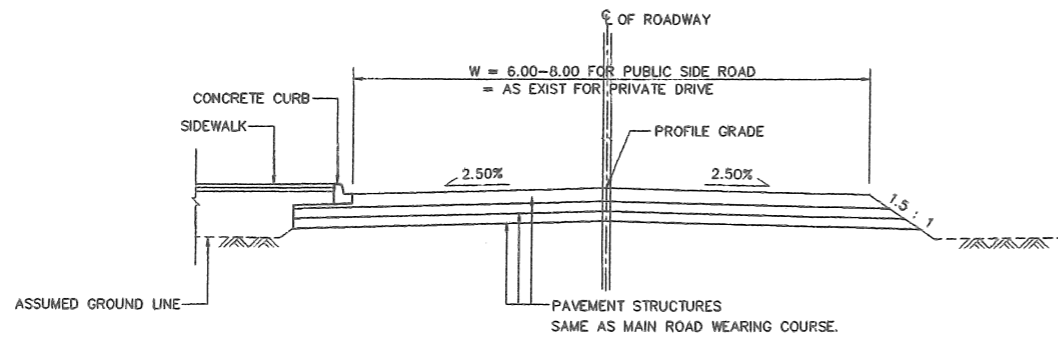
TYPICAL PRIVATE DRIVE AT SIDEWALK (PROFILE)
